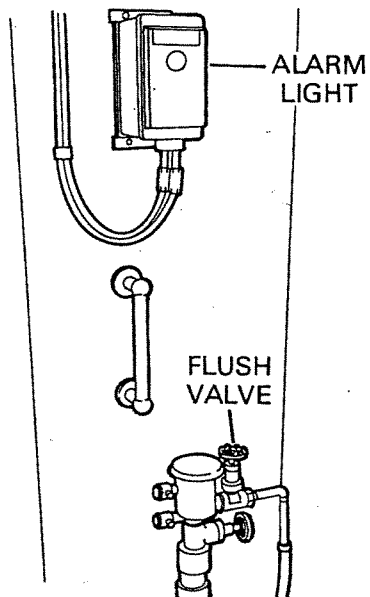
Water Closet Alarm Light (Frame 12, Port, Main Deck and 1st Platform)
